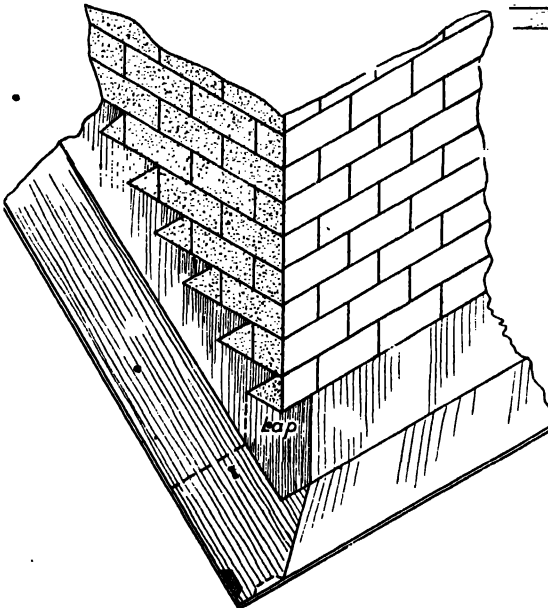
Flashing at corner of chimney stack, showing lap of side step flashing over front apron.
